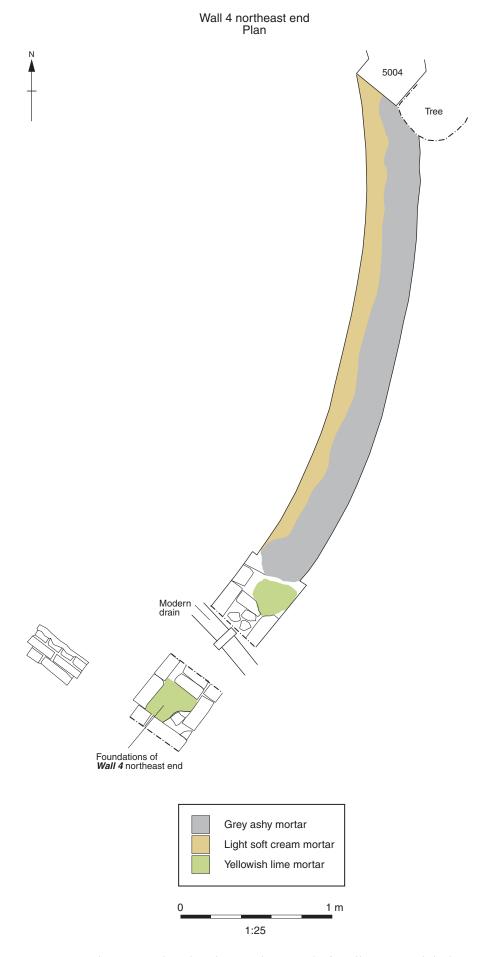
Plan showing northeast end of Wall 4 exposed during watching brief
